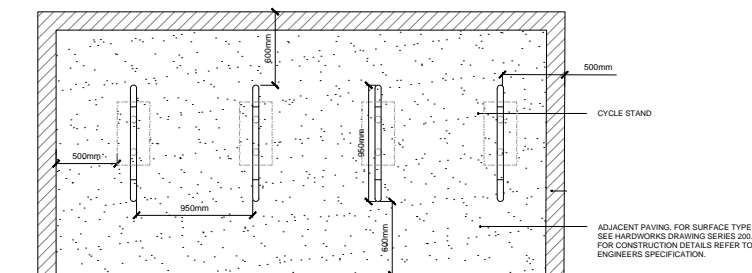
Cycle parking typical detail (not to scale; do not scale from these figures)
